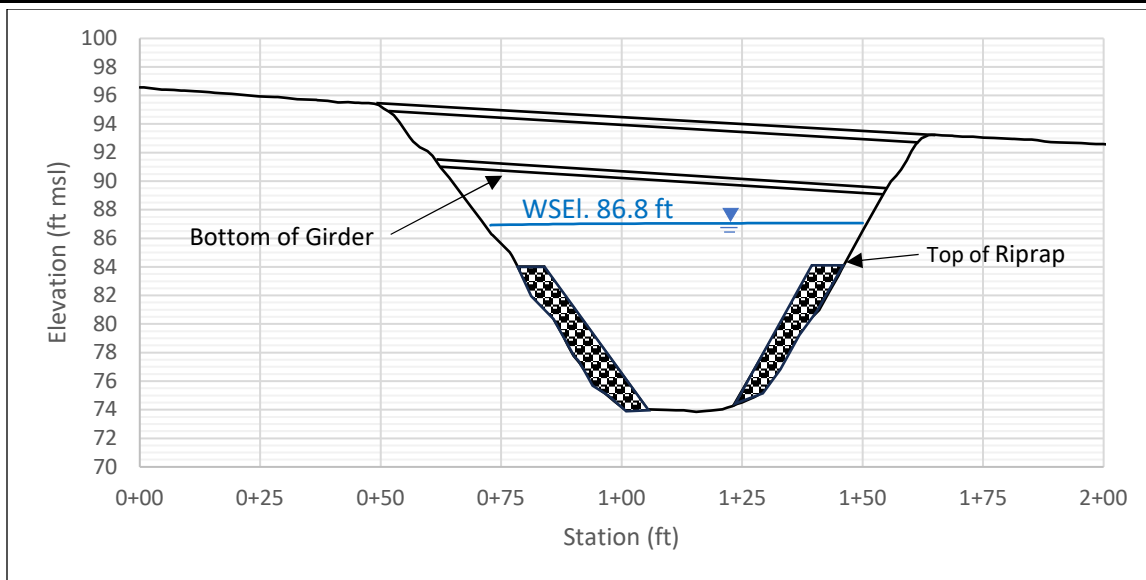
New Glenn Highway Bridge Profile; 1% AEP Flood (MOA72 Datum).
